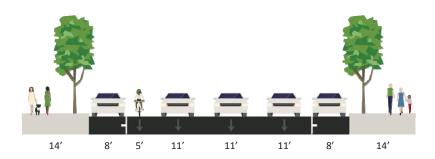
Tampa Street Typical Cross-Section, between Madison Street and Twiggs Street
